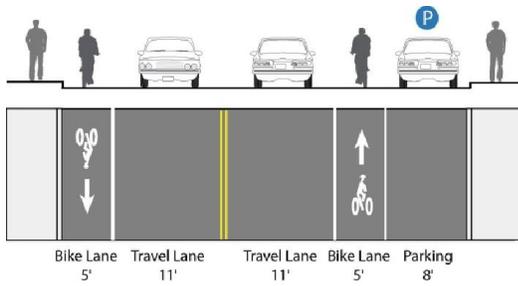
Pacific Avenue west of B Street (Existing Conditions)
